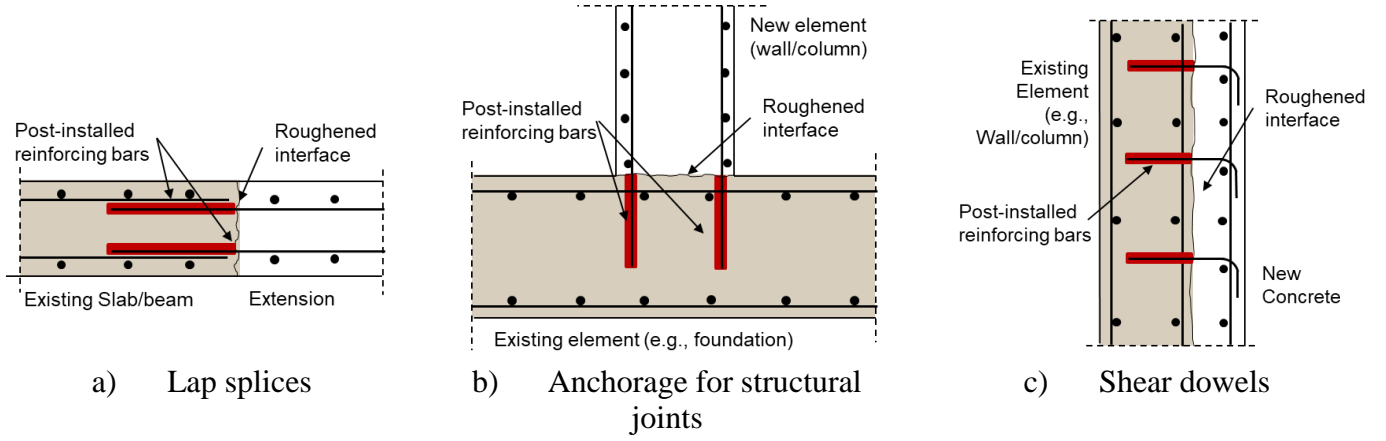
Typical concrete to concrete connections with post-installed reinforcing bars
